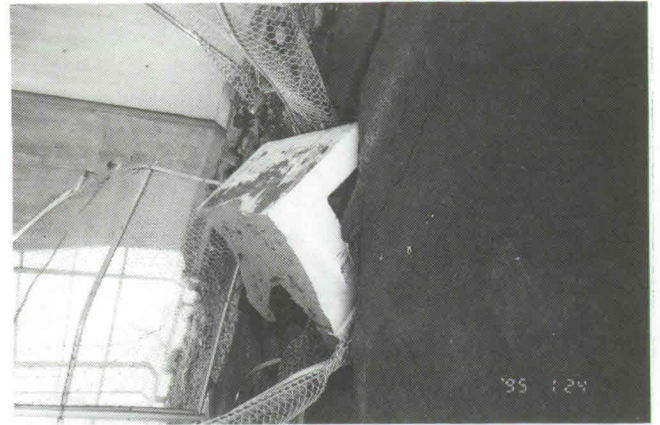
Broken section of upper shoe fallen from fixed bearing to the ground
